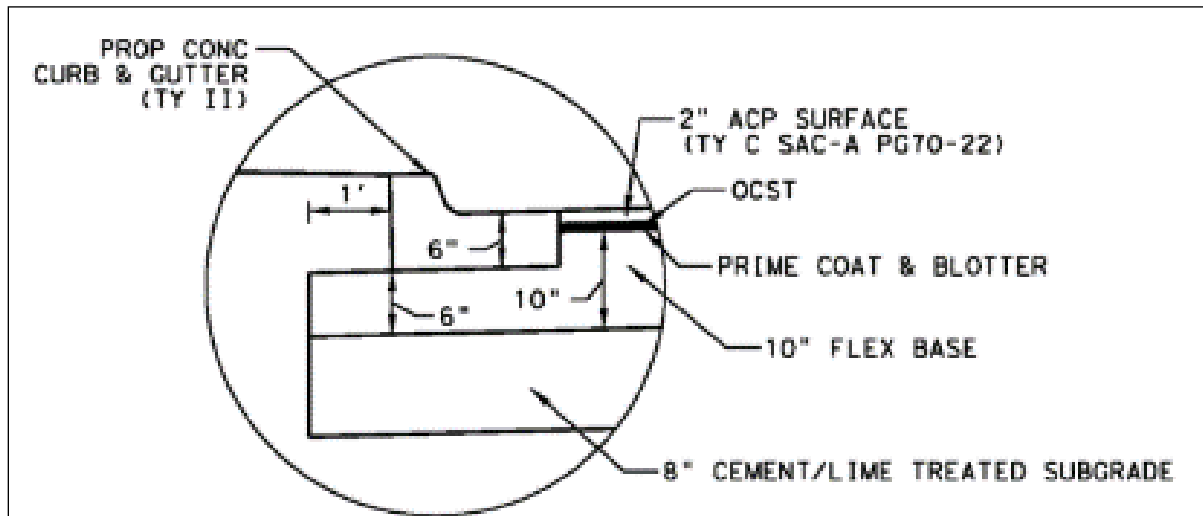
Post-Construction Widened Pavement Structure, Project 3.
